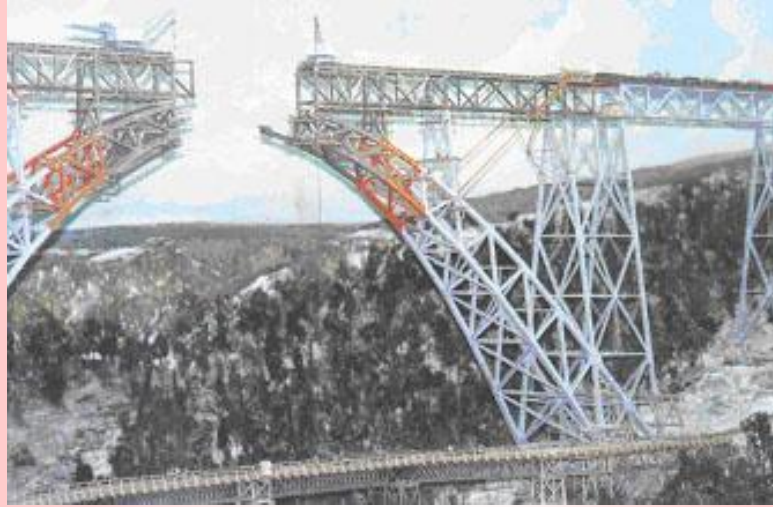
Bridge building – the bridges present supporting structures in its own basic shape
